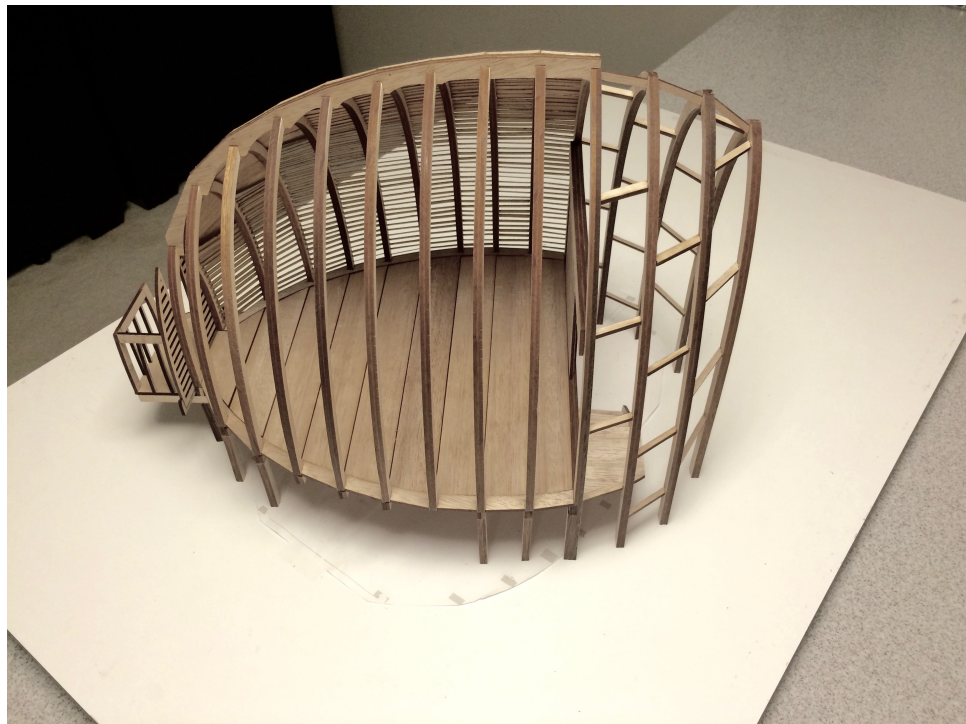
View 2 – Interior, walls and upper level will be built in next scale model
